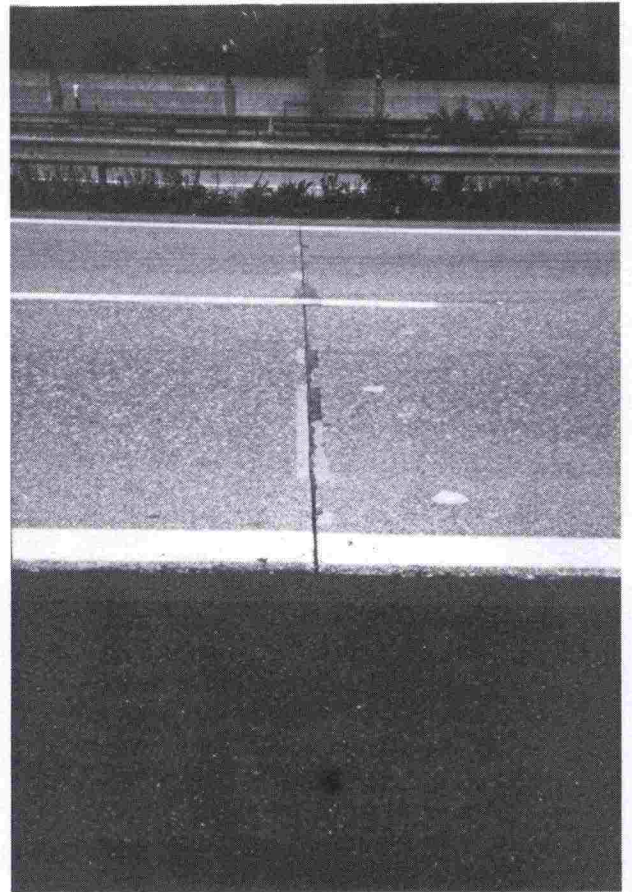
A damaged joint in an old concrete pavement, N1, Aarau, Switzerland
